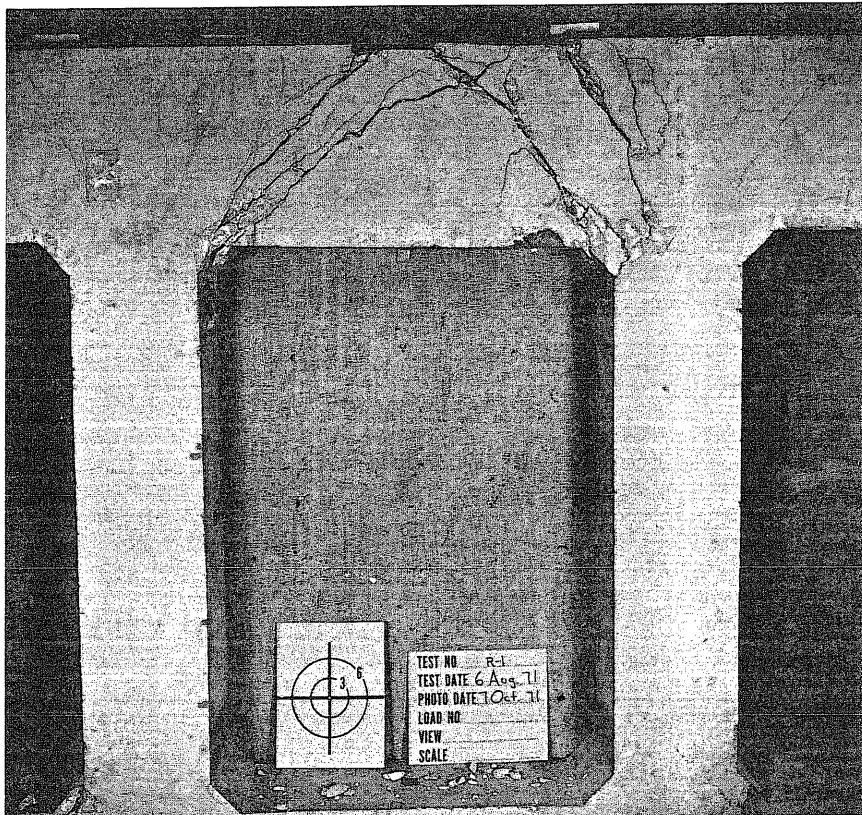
FAILED INTERIOR SPAN OF SPECIMEN R1
